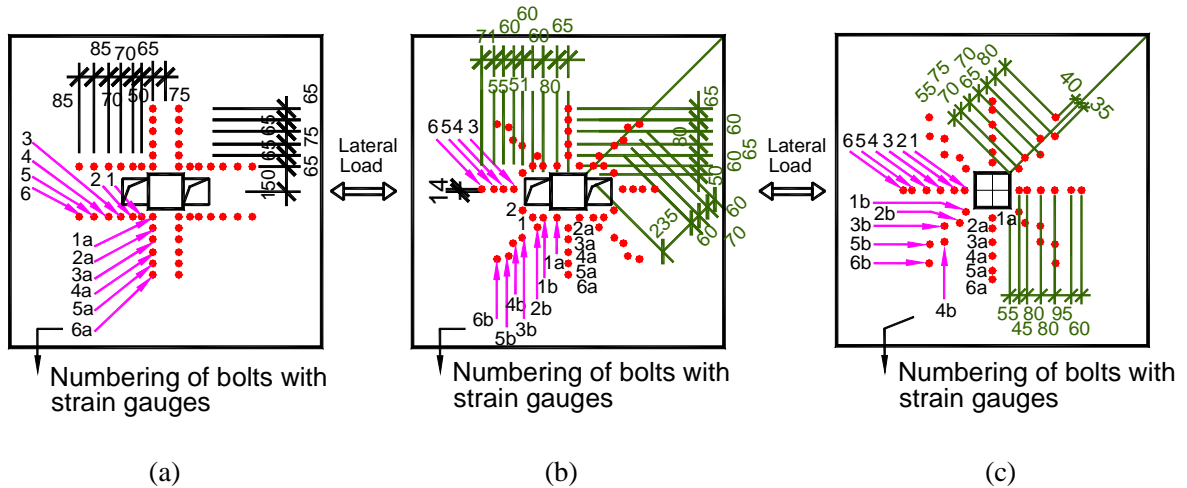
Shear bolt spacing in specimen SW7, SW8, SW9 and numbering of strain gauges on bolts
